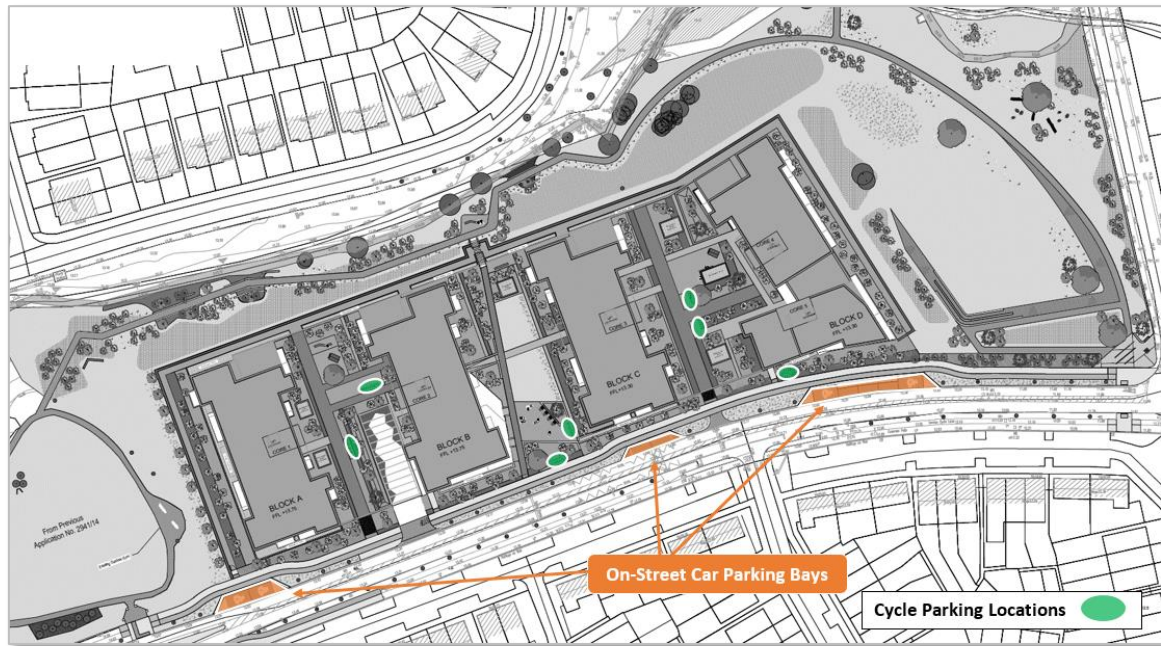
Proposed Surface Parking Layout (Vehicle and Cycle)
